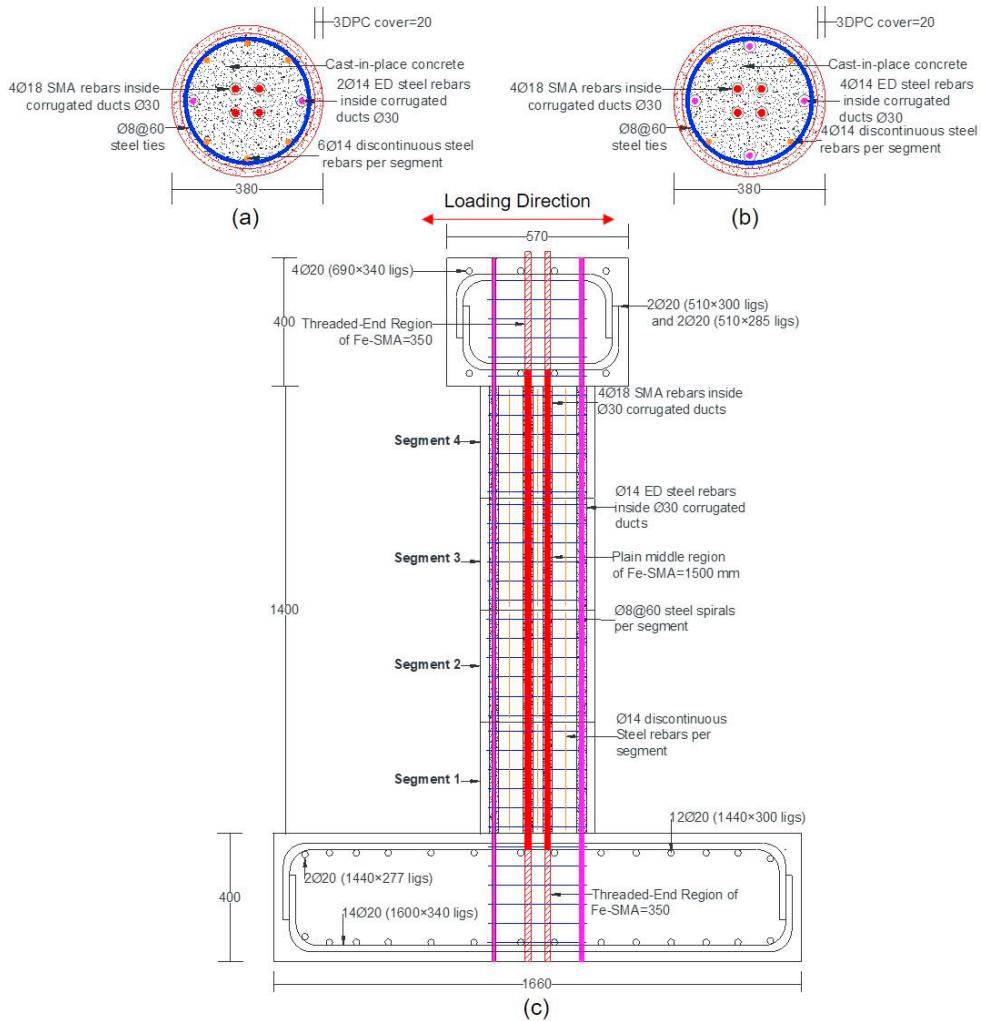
Design details of columns: a) S1-cross-section; b) S2-cross-section; c) front elevation (reprinted from Raza et al. 2024)
